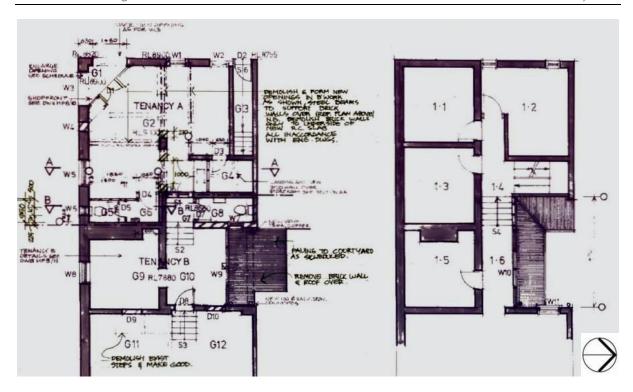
Alterations to the rear section of the ground floor (left) of 143–143a George Street to create a shop tenancy entered from the corner of Globe Street and Nurses Walk, 1978. The first floor plan (right) remained as shown until the 2010–2011 works. Stair 1.01 and the new lift now sit in the area formerly occupied by Room 1.2 and the adjacent stair. Source: PMNSW – ROX-410-AR-0033-OD, 1978.
